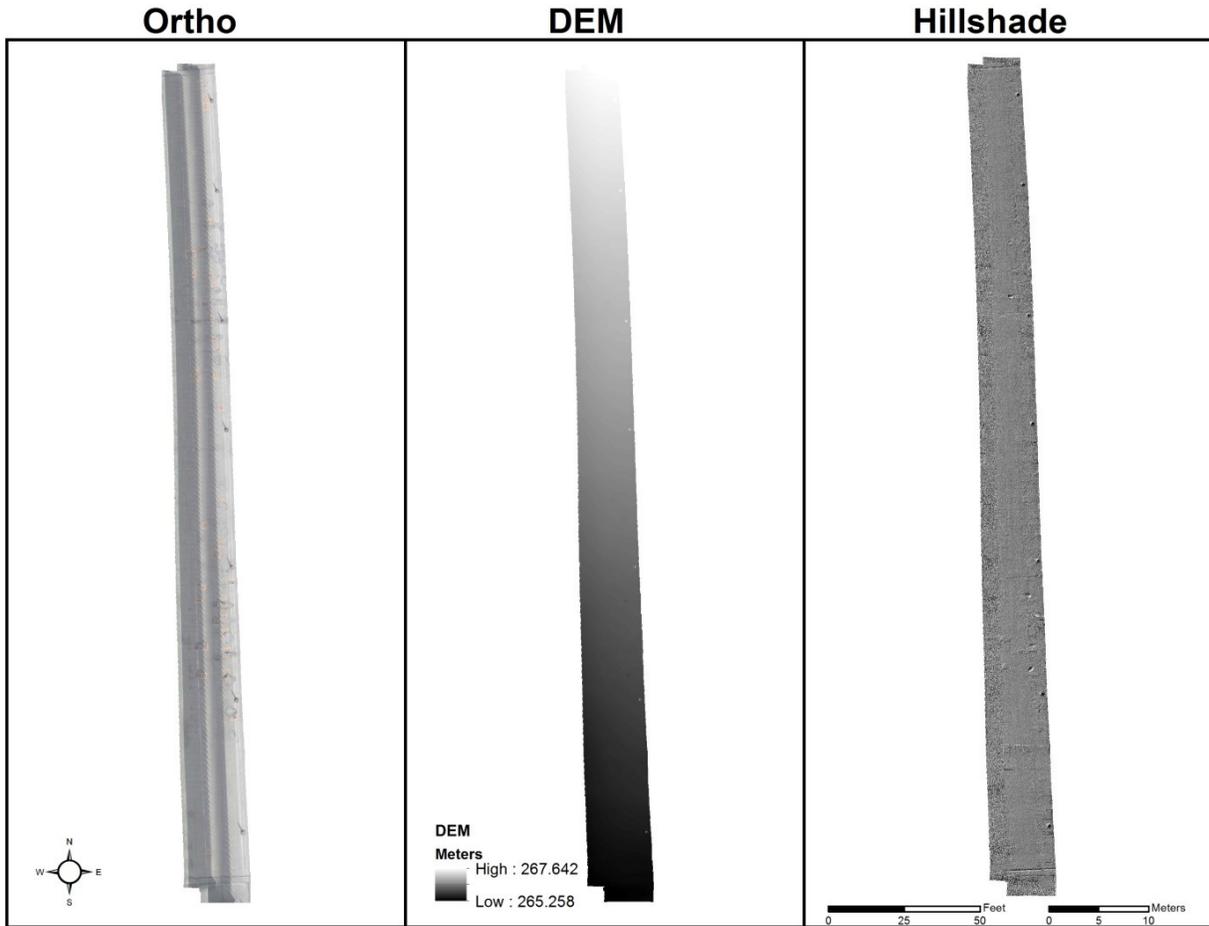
Location of potential delaminations and spalls on the I-696 bridge deck.
